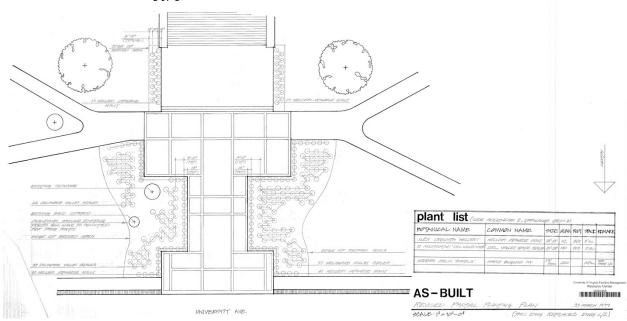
Planting as constructed drawing documents the plant materials layout and quantities for the Rotunda Lower Forecourt project completed in 1977. (R-JAV-FMRC-FF-1977-03-30-65487_0p10-M-2-RotundaTerrAsBuiltPlanting.jpg)
